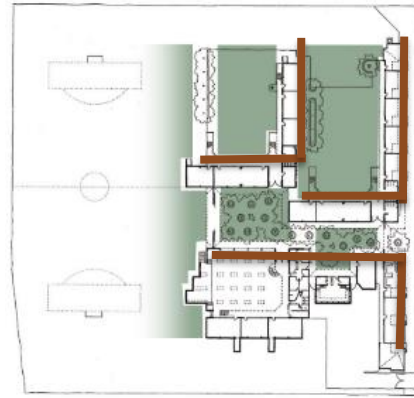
Plan indicating L-formed arrangement of school blocks and variation in courtyard sizes (Adapted by author, from Wolff Architects (2024:online))
